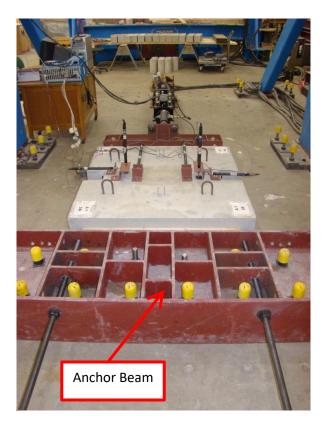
Attachment of a Test Specimen to the Anchor Beam
